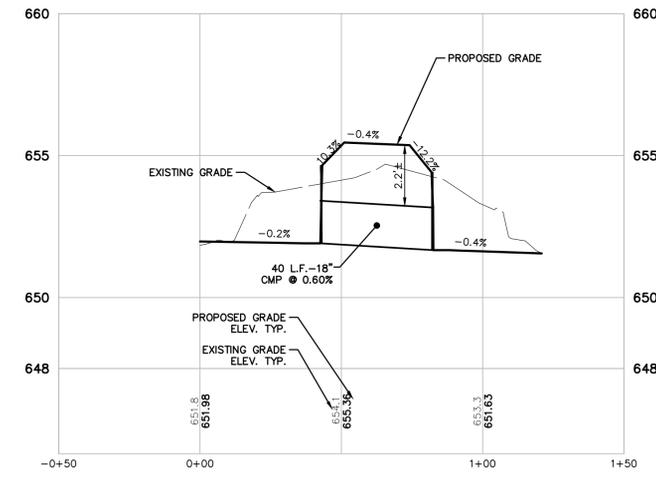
DETAILED ACCESS ROAD GRADING SCALE 1" = 60'
